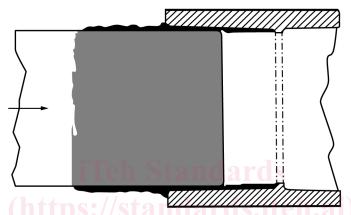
Components must be Assembled while all Surfaces are Wet and Soft
